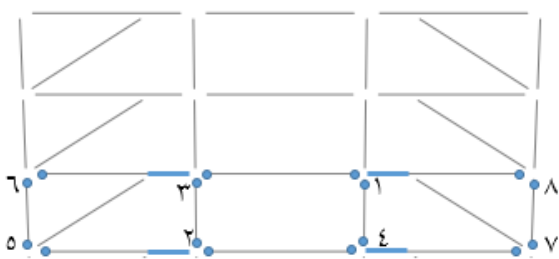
Plastic joints in 23rd floor of 25 storey frame
